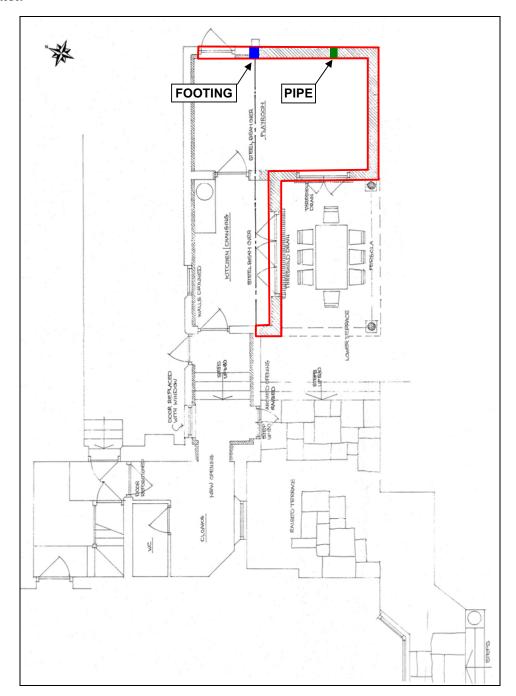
Proposed development plan, with footing trench outlined in red (scale 1:100)
